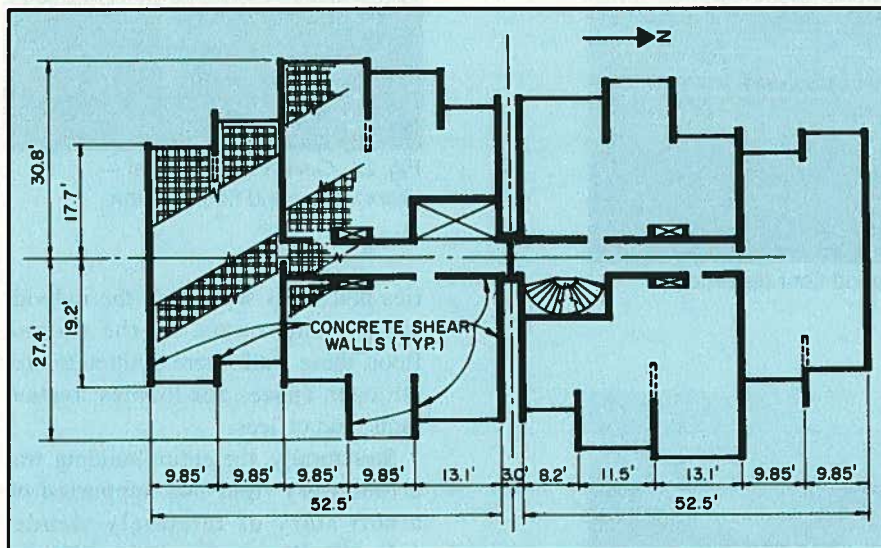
Floor plan of Plaza One Building, Caracas, Venezuela.
